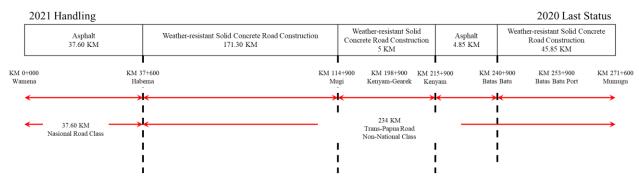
Handling of the Wamena - Habema - Kenyam - Mumugu road section
